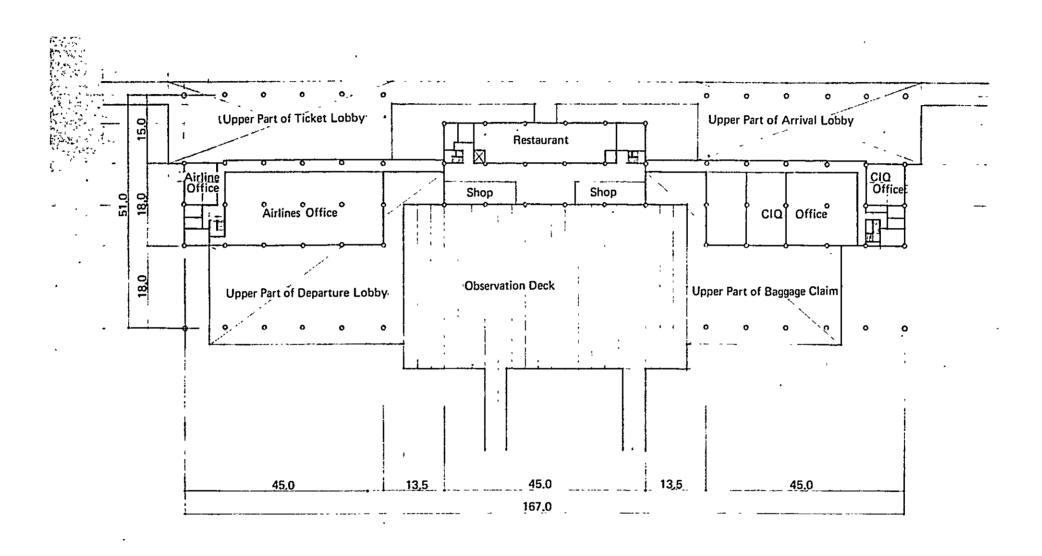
Proposed International Airport Terminal Building 2nd Floor Plan
